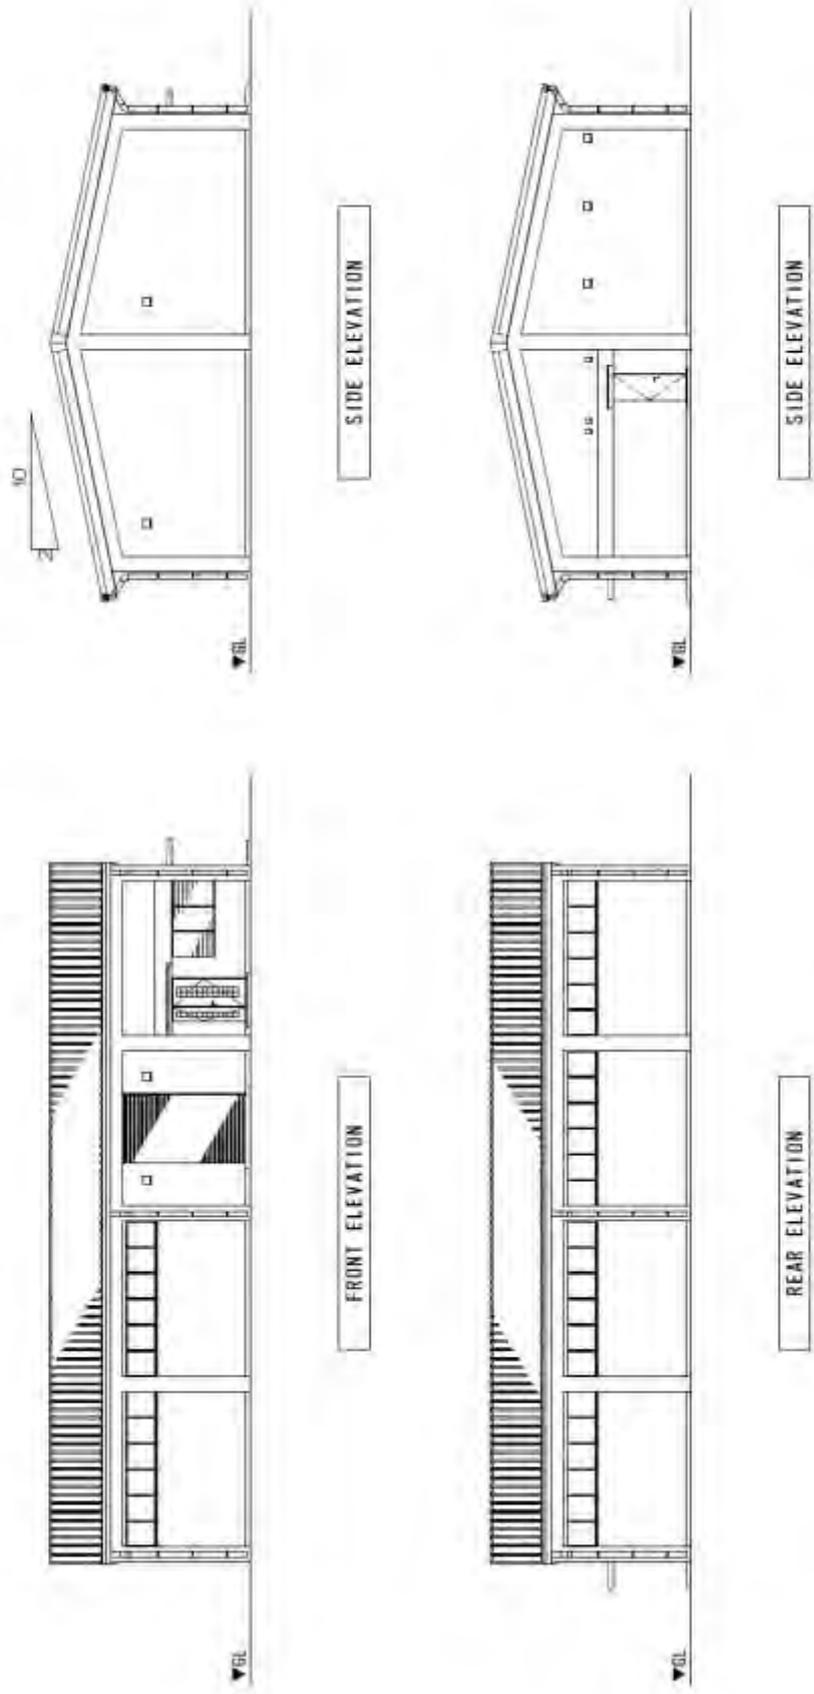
Elevational Plan of Kotokrom Primary Substation
